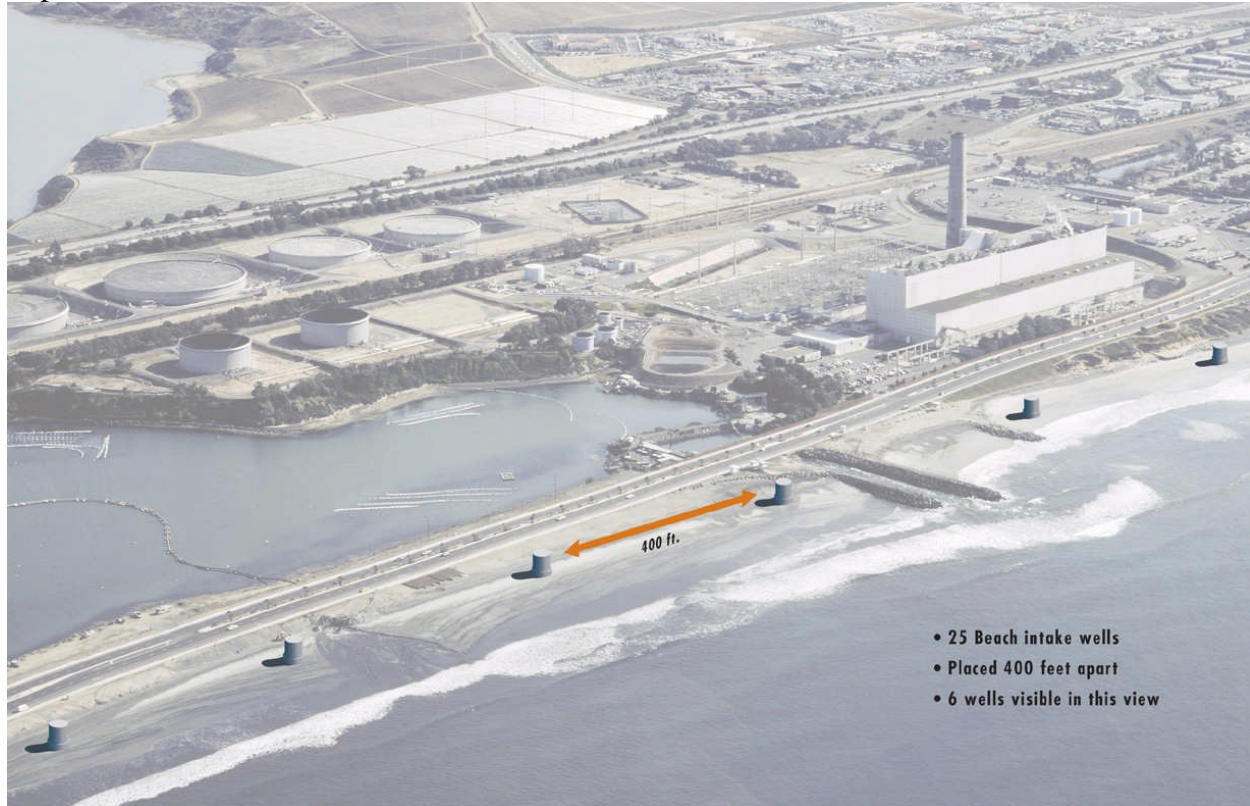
A Horizontal Beach Well System for 10 MGD Desalination Plant
